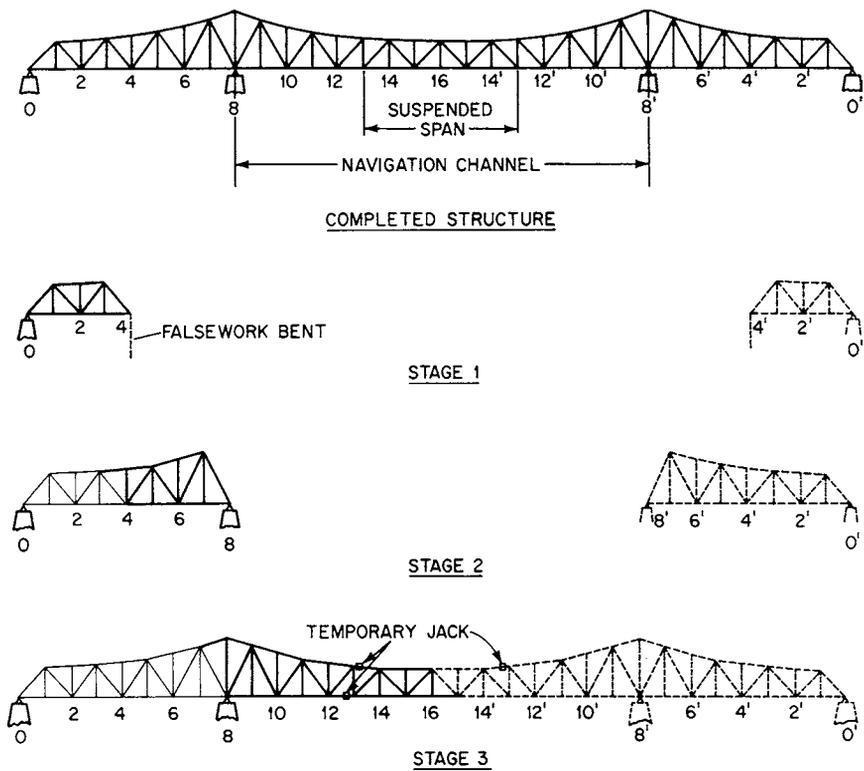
Erection stages for a cantilever-truss bridge. In Stage 1, with falsework at panel point 4, the portion of the truss from the abutment to that point is assembled on the ground and then erected on the abutment and the falsework. The operations are duplicated at the other end of the bridge. In Stage 2, members are added by cantilevering over the falsework, until the piers are reached. Panel points 8 and 8' are landed on the piers by jacking down at the falsework, which then is removed. In Stage 3, main-span members are added by cantilevering over the piers, until midspan is reached. Jacks are inserted at panel points L13, U13, and U13'. The main span is closed by jacking. The jacks then are unloaded to hang the suspended span and finally are removed.
